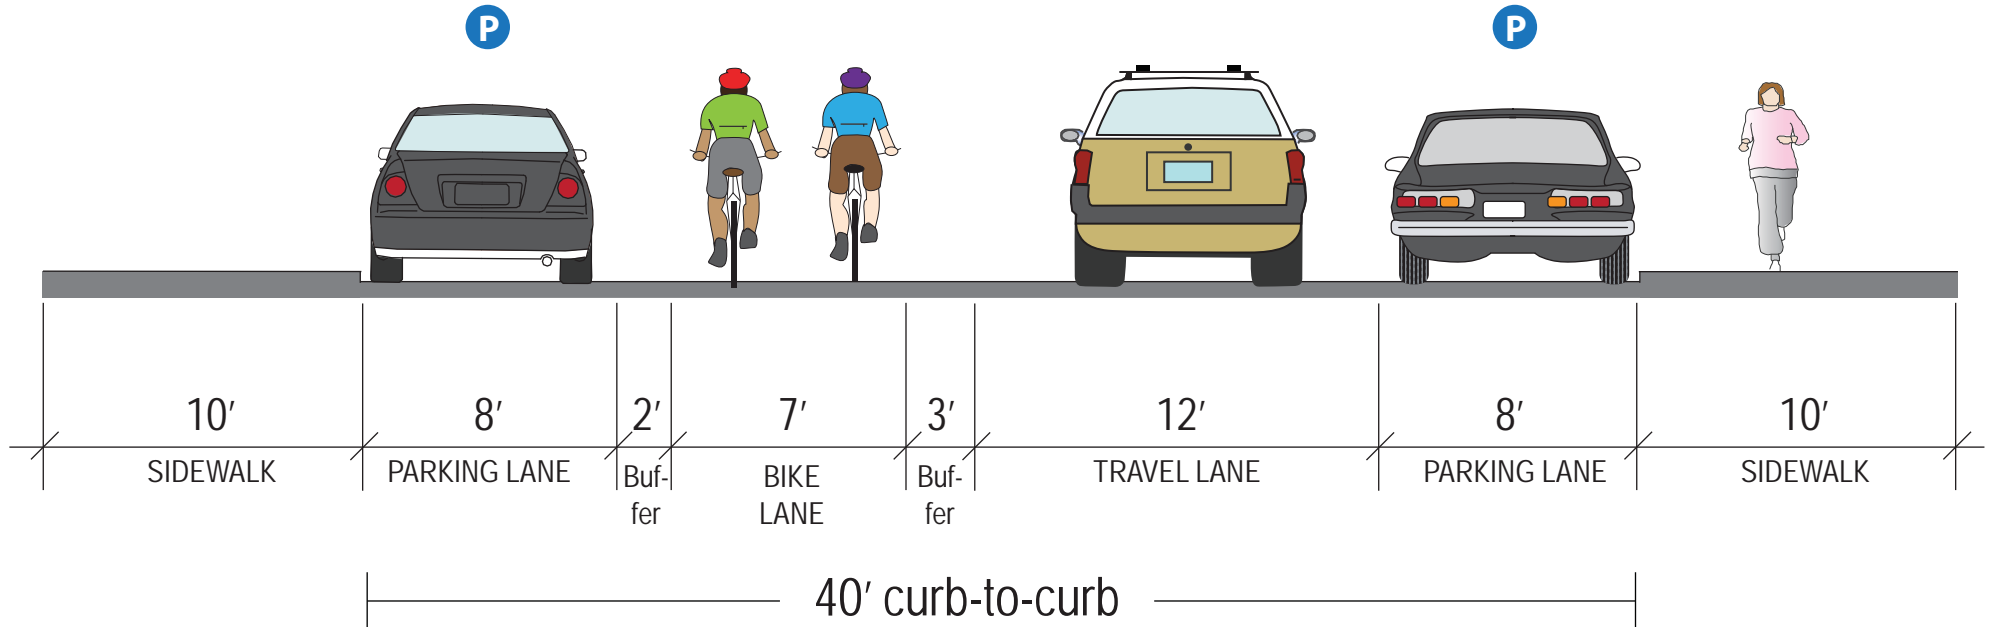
Existing street cross section between Hancock Street and Killingsworth Street
